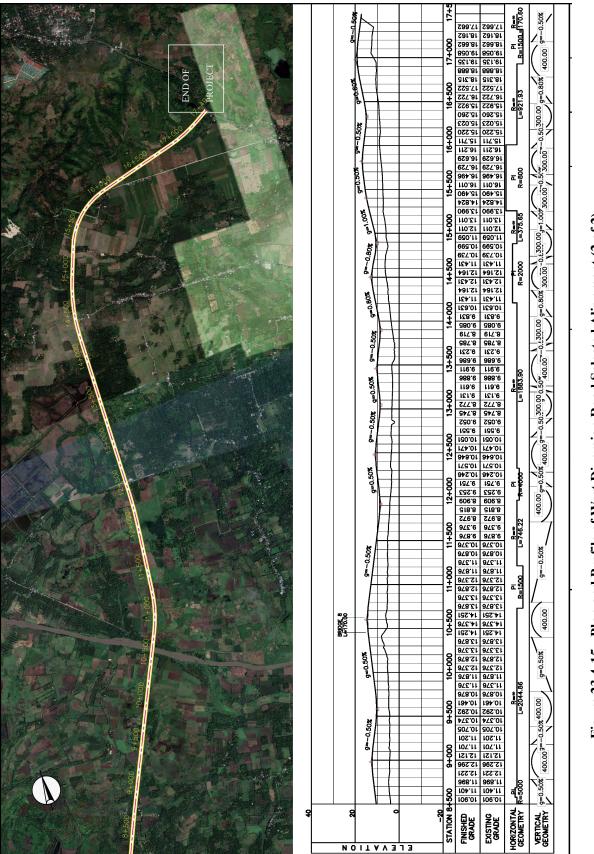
Plan and Profile of West Diversion Road Selected Alignment (2 of 2)
